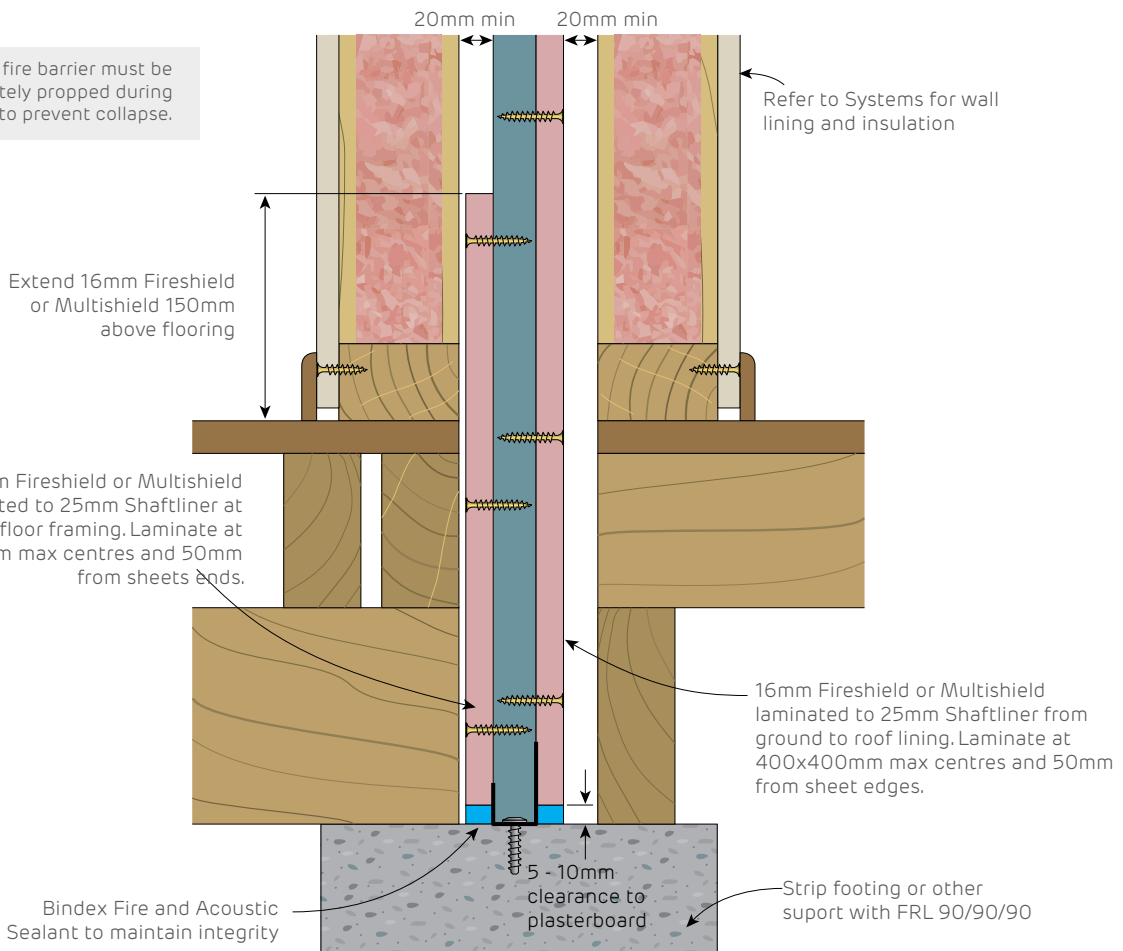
Interhome Wall Base to Slab FRL 90/90/90 Section
